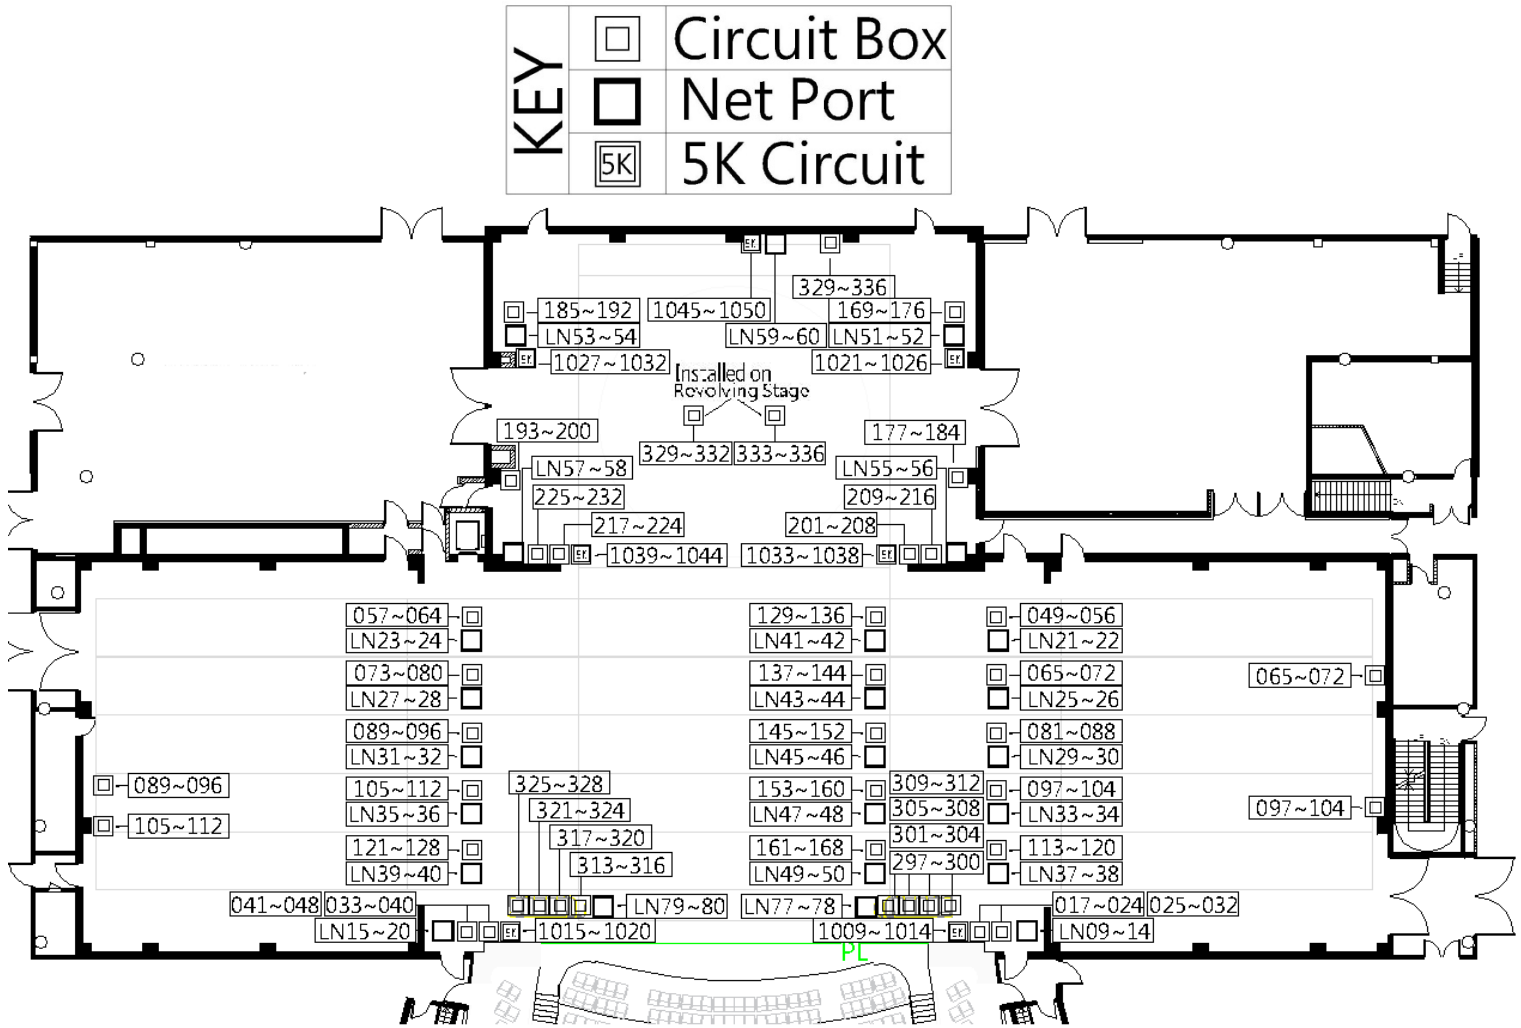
First Floor Lighting Circuit Layout
